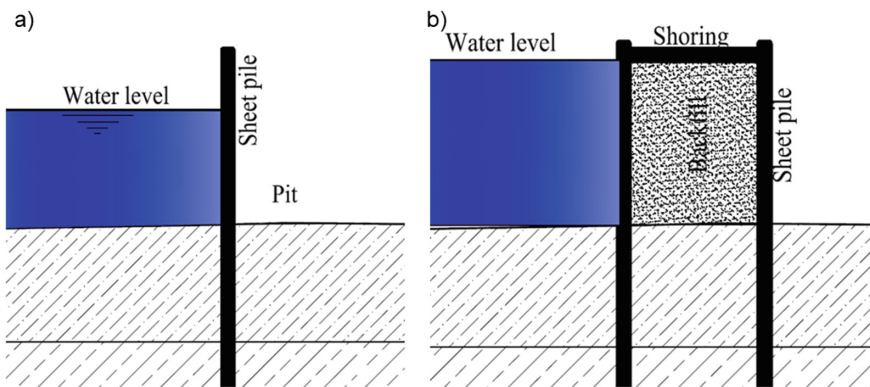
Cross-section of cofferdam: a Single wall; b Double wall
